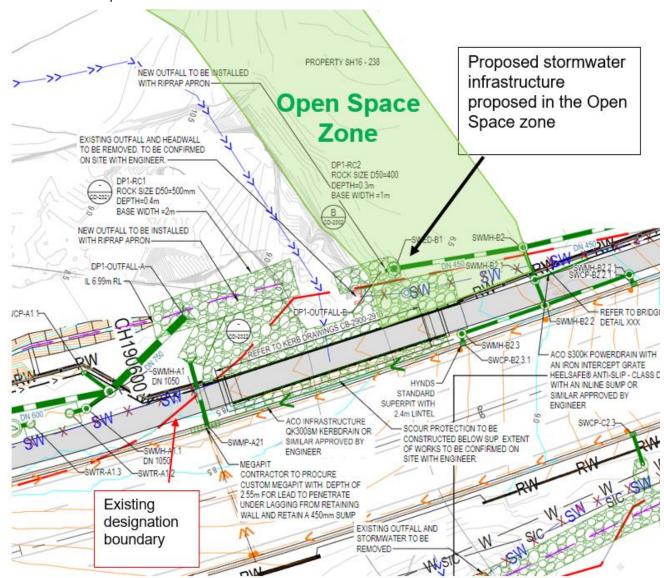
Stormwater infrastructure proposed within the Open Space - Conservation
